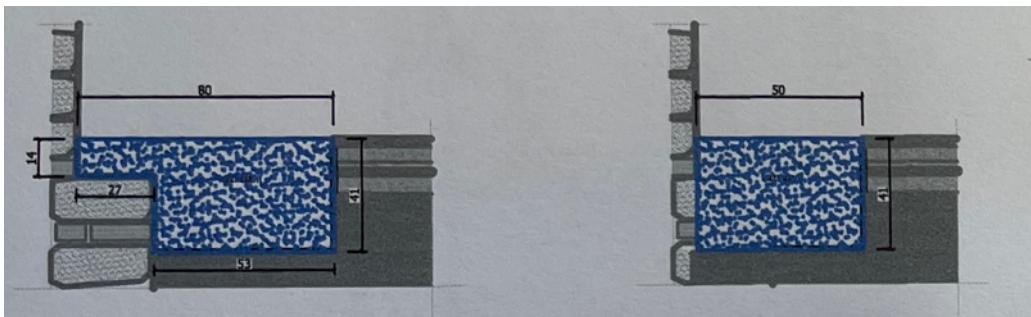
The partial section of load bearing wall (left) and the column (right) on the ground level of 3<sup>rd</sup> Construction phase of IAM (source: IDSM Archive) blue color shows the area had to be excavated
